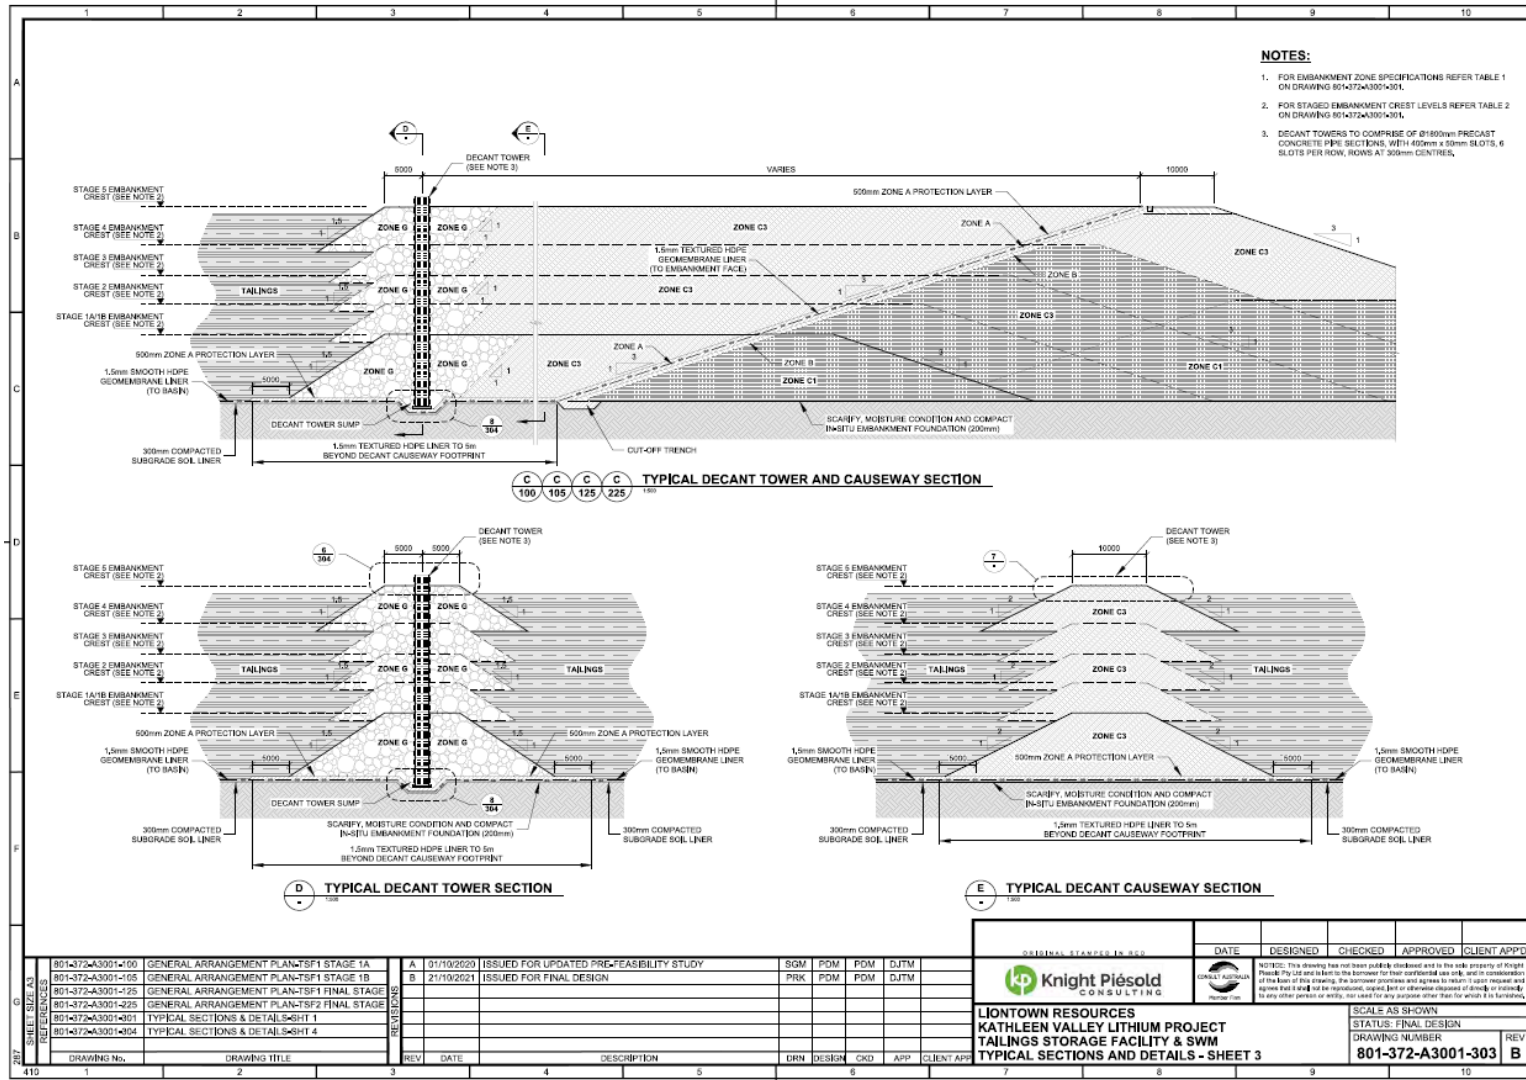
Tailings Storage Facility Section Detail, Decant Tower – 801-372-A3001-303
